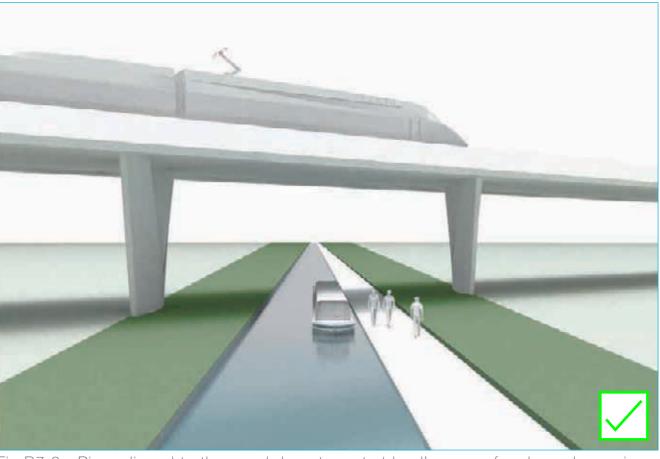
Piers aligned to the canal do not create 'dead' spaces for skewed crossings
